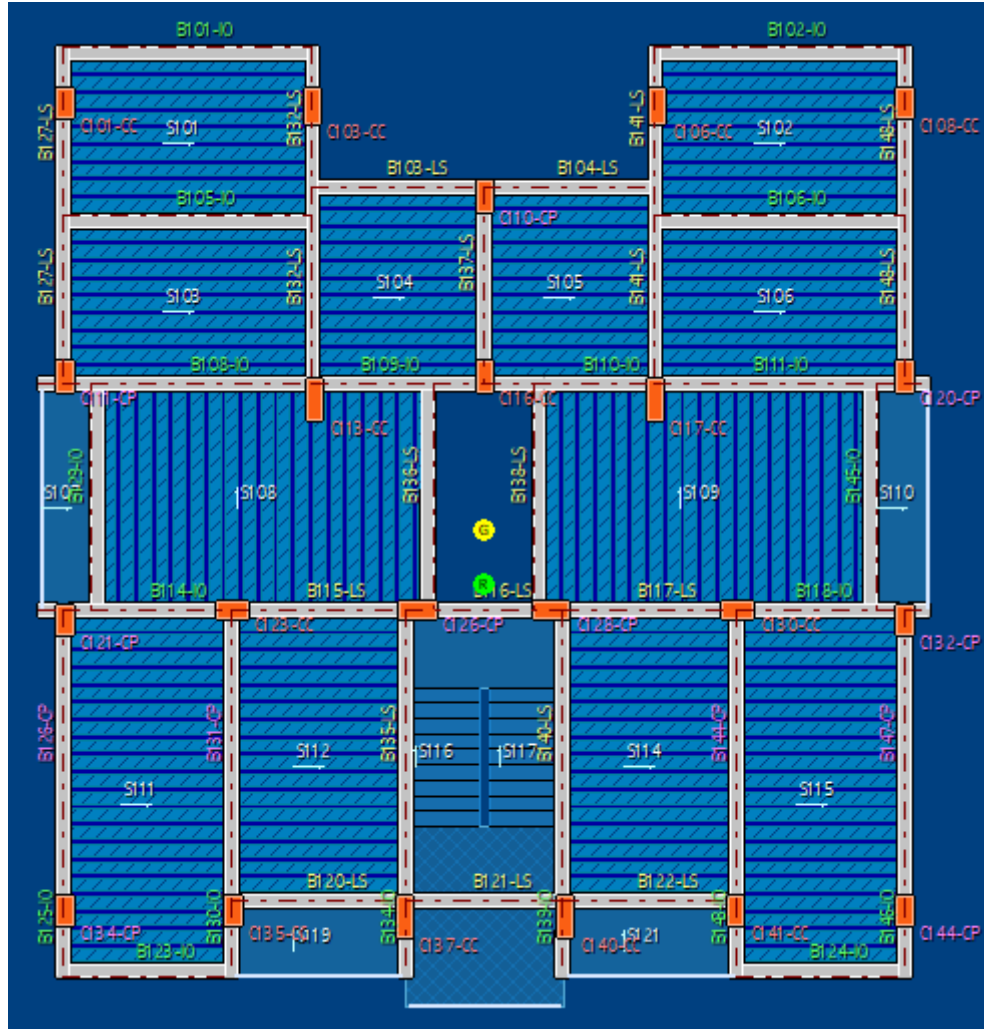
Section damages on ground floor for an existing apartment type mass housing structure
